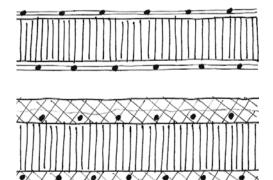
Sketches of wall construction (horizontal sections) Top: the rigid PU foam insulation between two layers of reinforcing mesh serves as permanent formwork. Bottom: rigid PU foam insulation panel covered with two coats of sprayed concrete both sides Philip Johnson: Gate House, New Canaan (USA), 1995 used at Gate House is based on an Italian patent which Johnson's structural engineer, Ysrael A. Seinuk, brought to his attention. Normally, this method of construction – in the form of panels made from two parallel layers of reinforcing mesh and an intervening layer of insulation (rigid polyurethane foam), the whole covered with a thin layer of sprayed concrete – is used to construct cheap housing. Unlike conventional concreting no formwork is required. In order to erect the complex shapes required at Gate House the horizontal sections through the building were built as wooden templates and positioned with the help of a scaffold.
